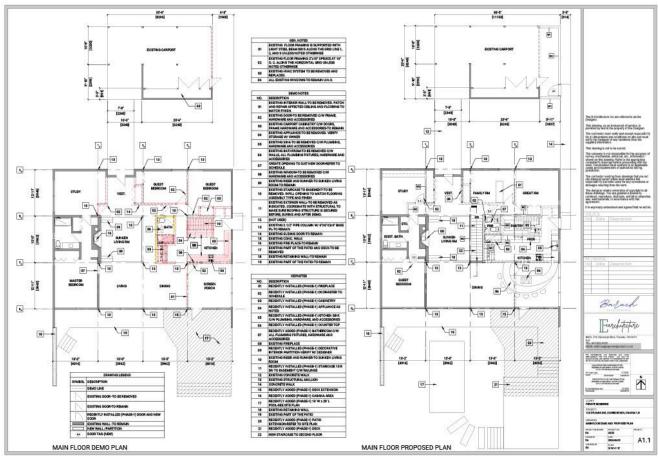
Main floor plan, removed portions in red (E-Architecture Inc., 2024)
